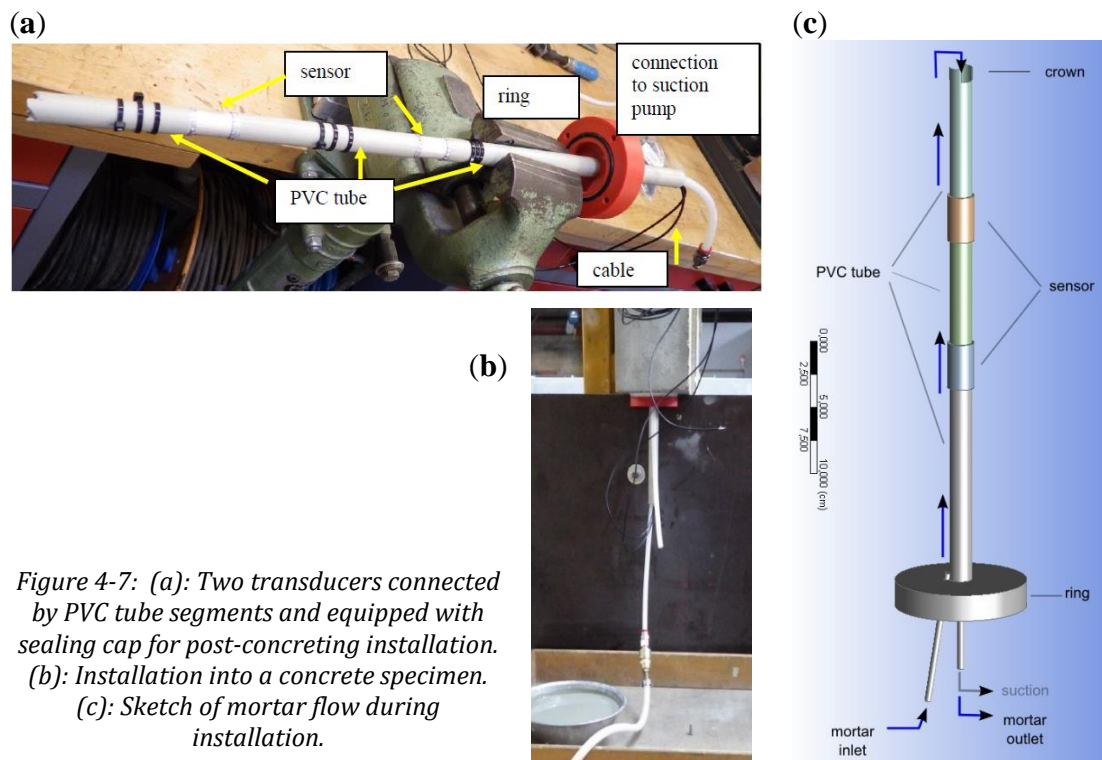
(a): Two transducers connected by PVC tube segments and equipped with sealing cap for post-concreting installation. (b): Installation into a concrete specimen. (c): Sketch of mortar flow during installation.
